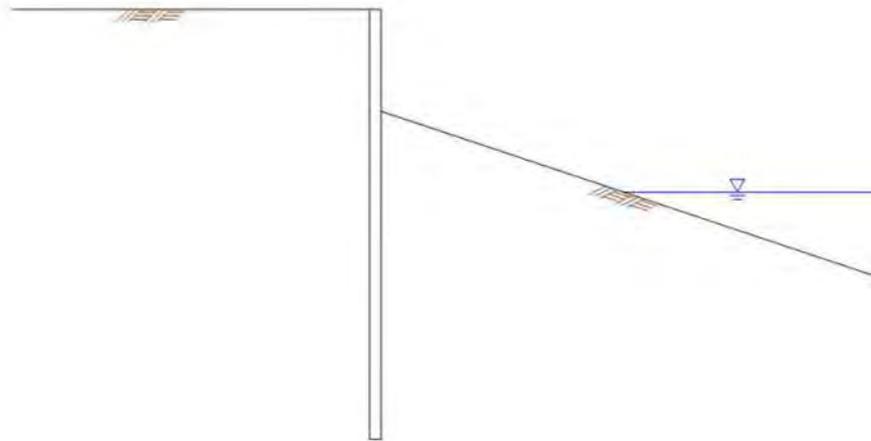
Slope Stability Wall Section Diagrams, Wall near Slope
